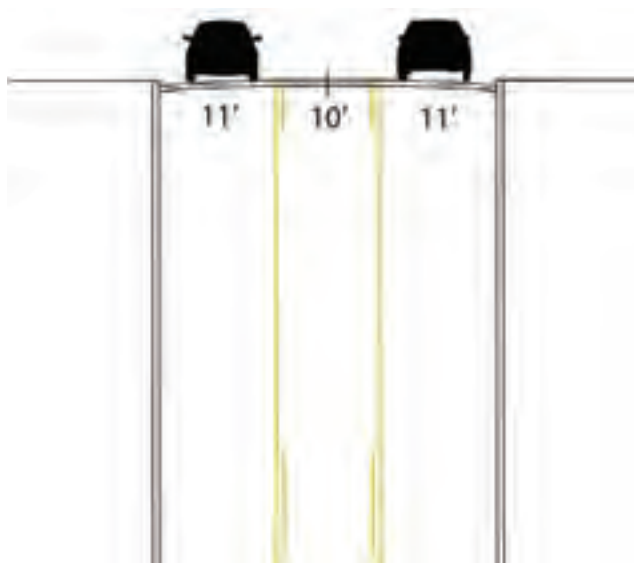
Option 1 - 32-feet of Broad Street with Two 11-foot Travel Lanes and a 10-foot Central Turning Lane
